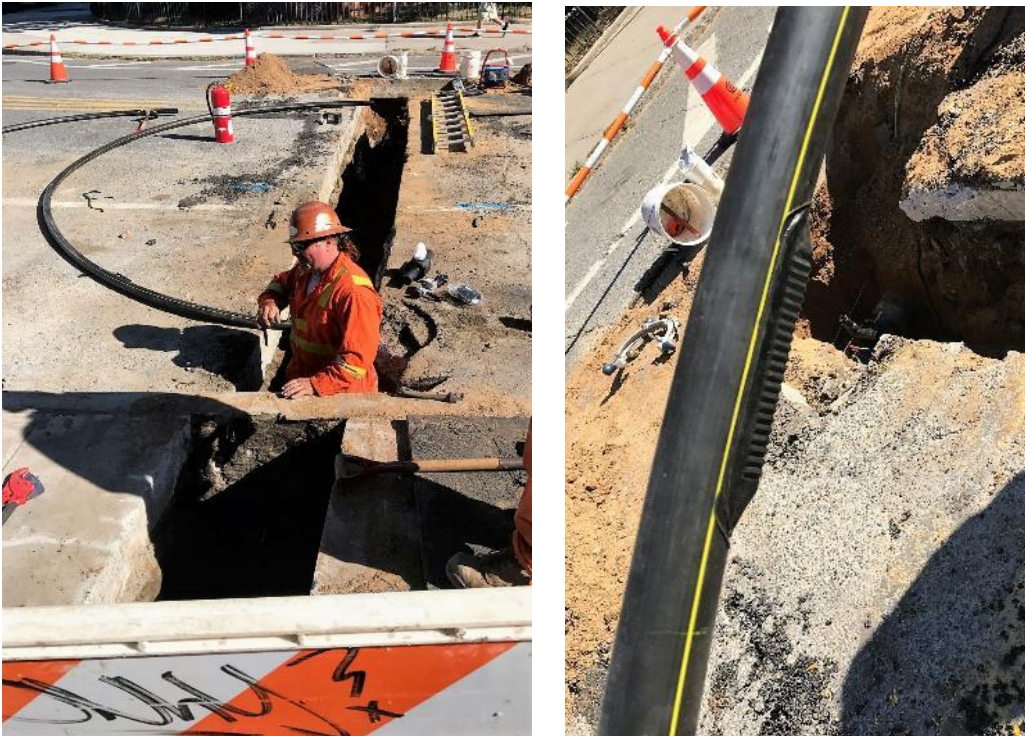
Crews installing ILPP pipe to replace aged pipe in Location A
